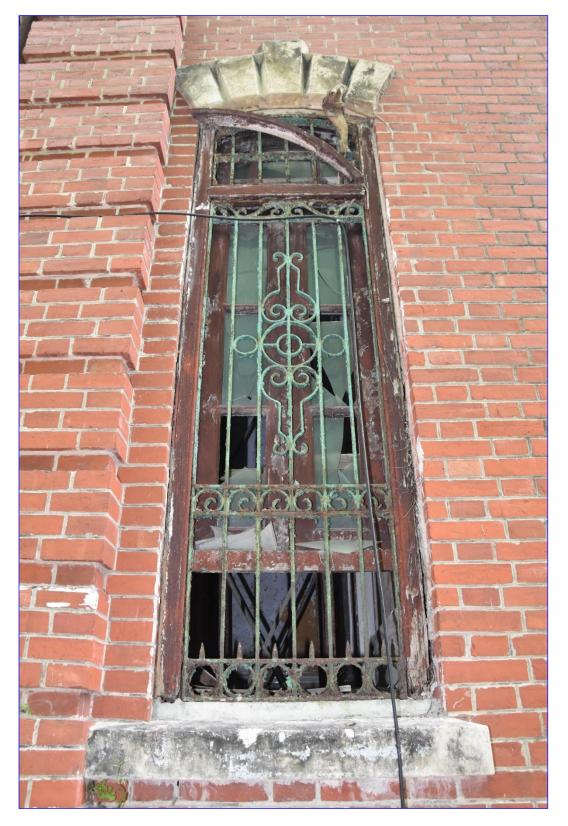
South-east elevation (facing Ship Street), ground floor, window Wdw-Gf06, (21st March, 2023)23)
